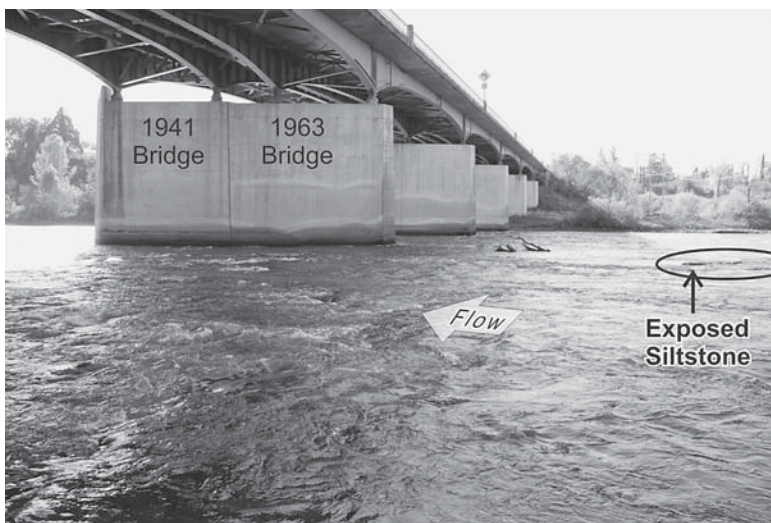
State Route 273 Bridge over Sacramento River—view looking toward right abutment.
